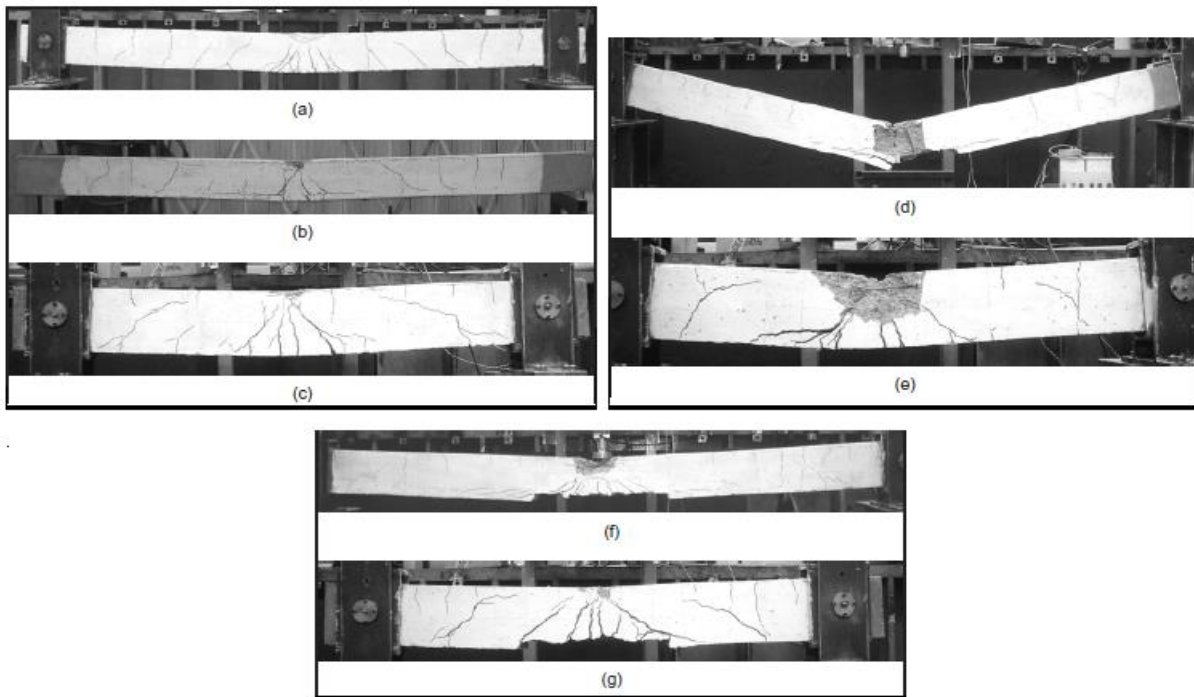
Post-test crack pattern of beams: (a) beam A1; (b) beam A2; (c) beam A3; (d) beam B1; (e) beam B2; (f) beam B3 and (g) beam B4 (Chen & May, 2009).
